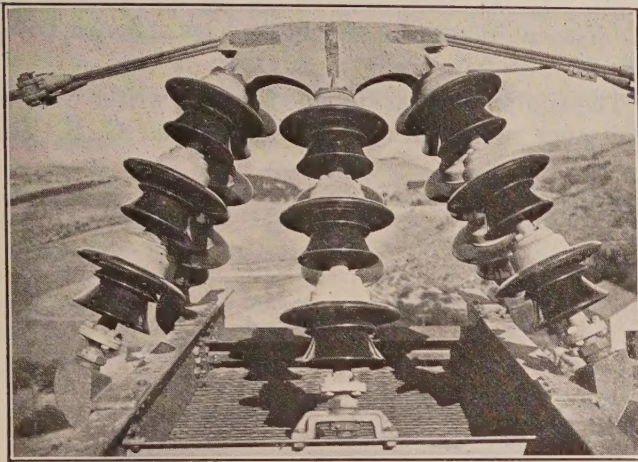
VIEW OF TOWER SUPPORT ON TOWER ADJACENT TO ANCHOR
